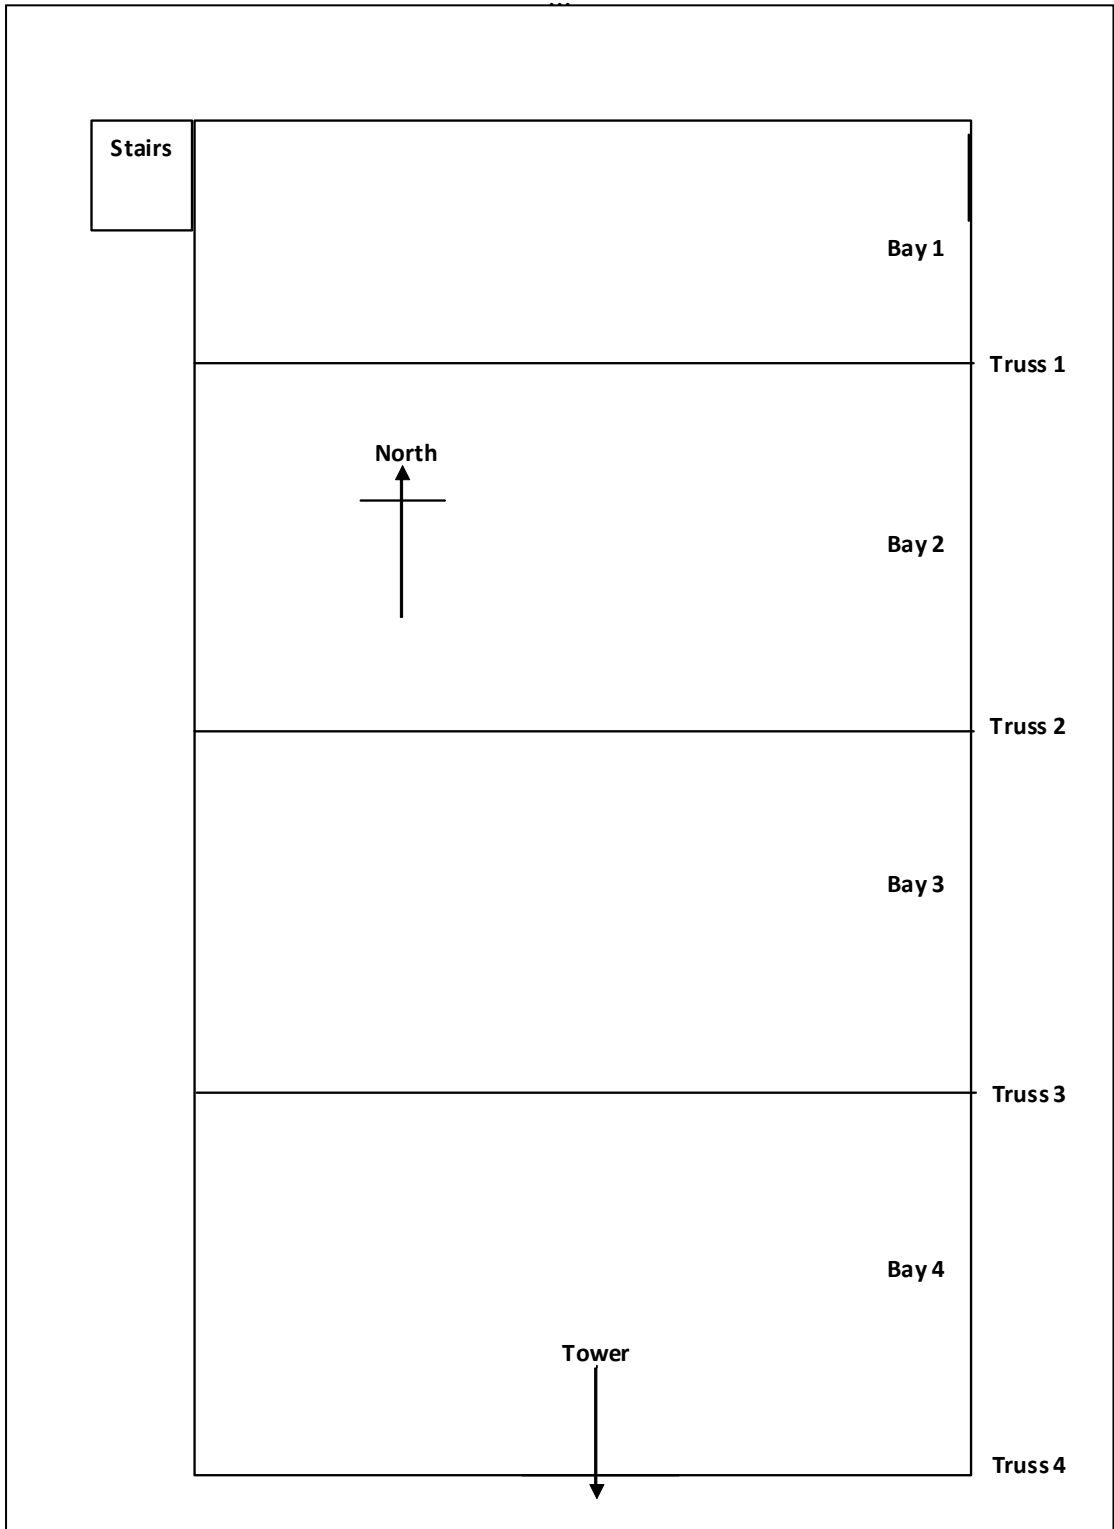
Simple plan of north-west transept to show truss and bay positions
